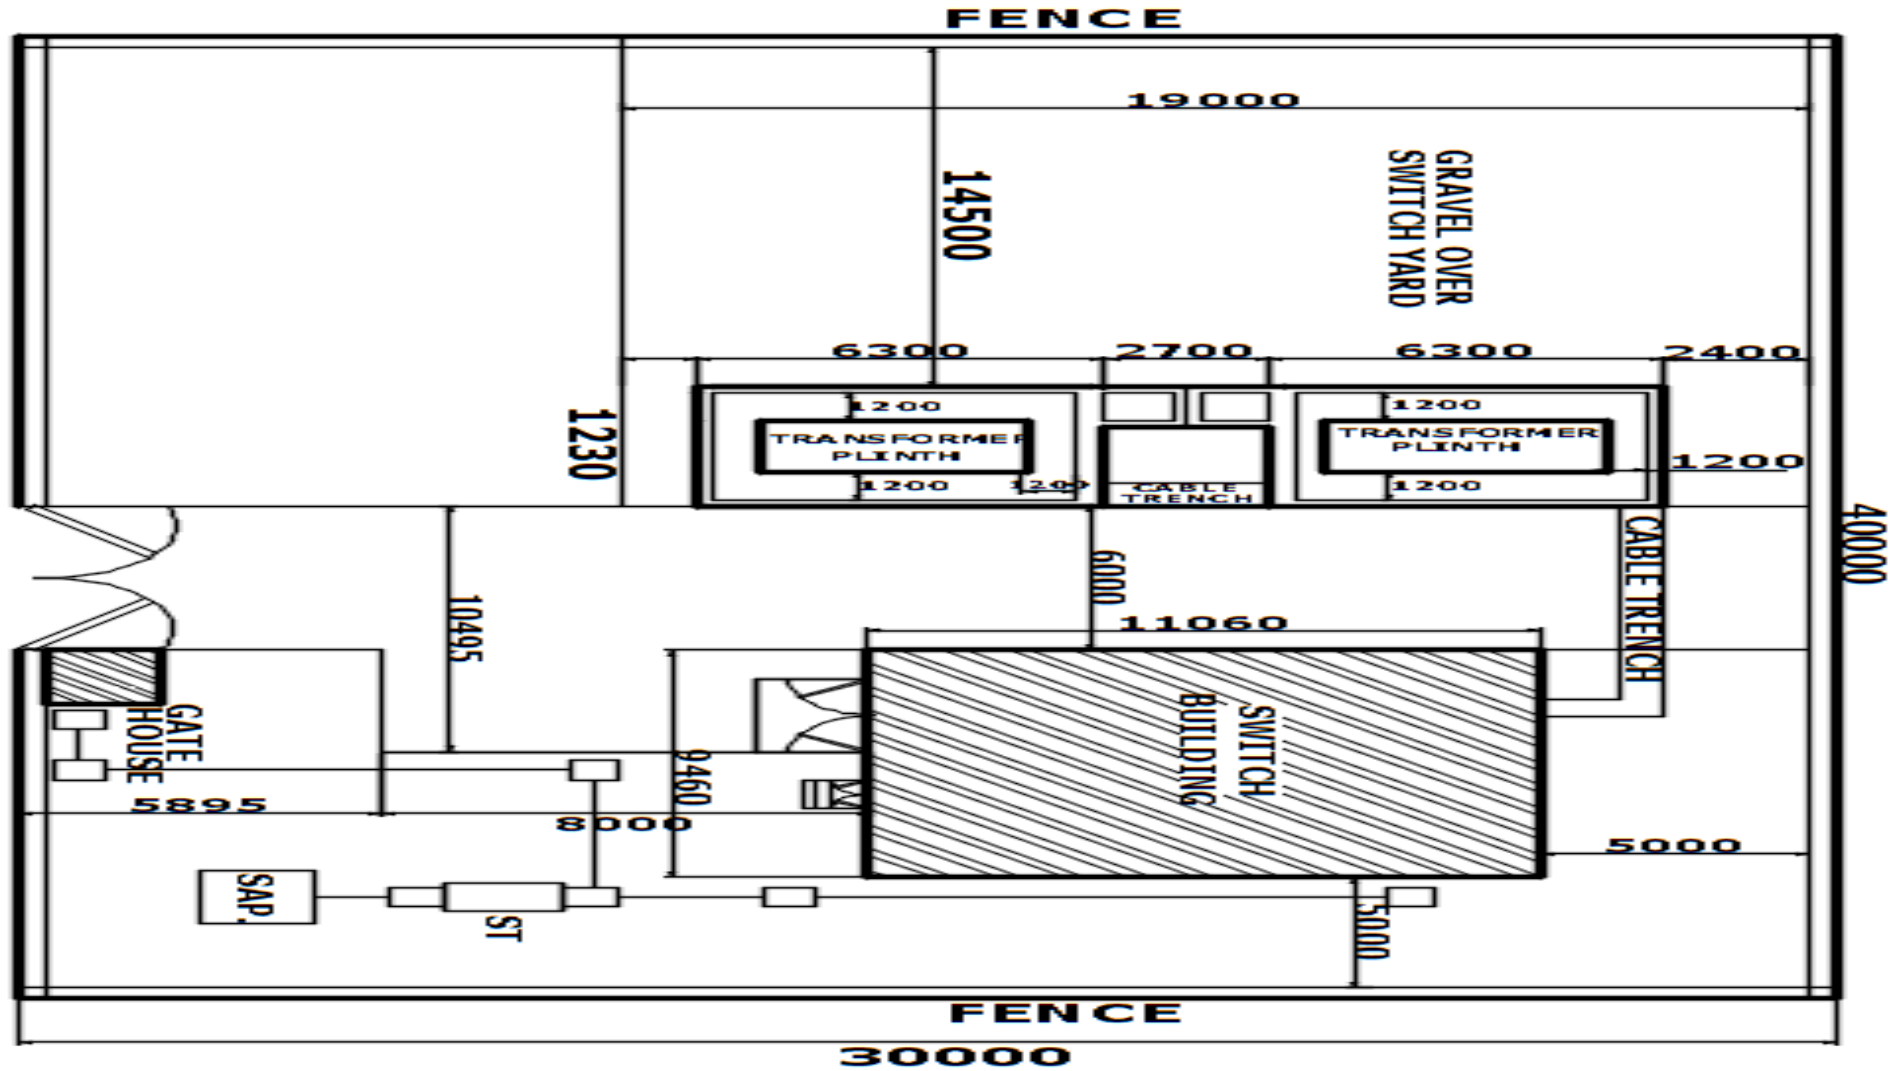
Top-Down View of a Substation Site (All Dimensions in mm)
